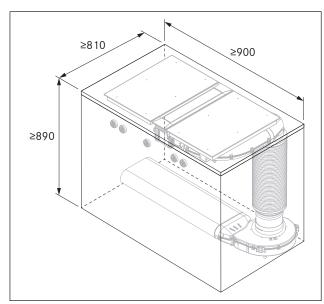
Minimum installation dimensions for standard set-up of PKA3/PKA3AB
